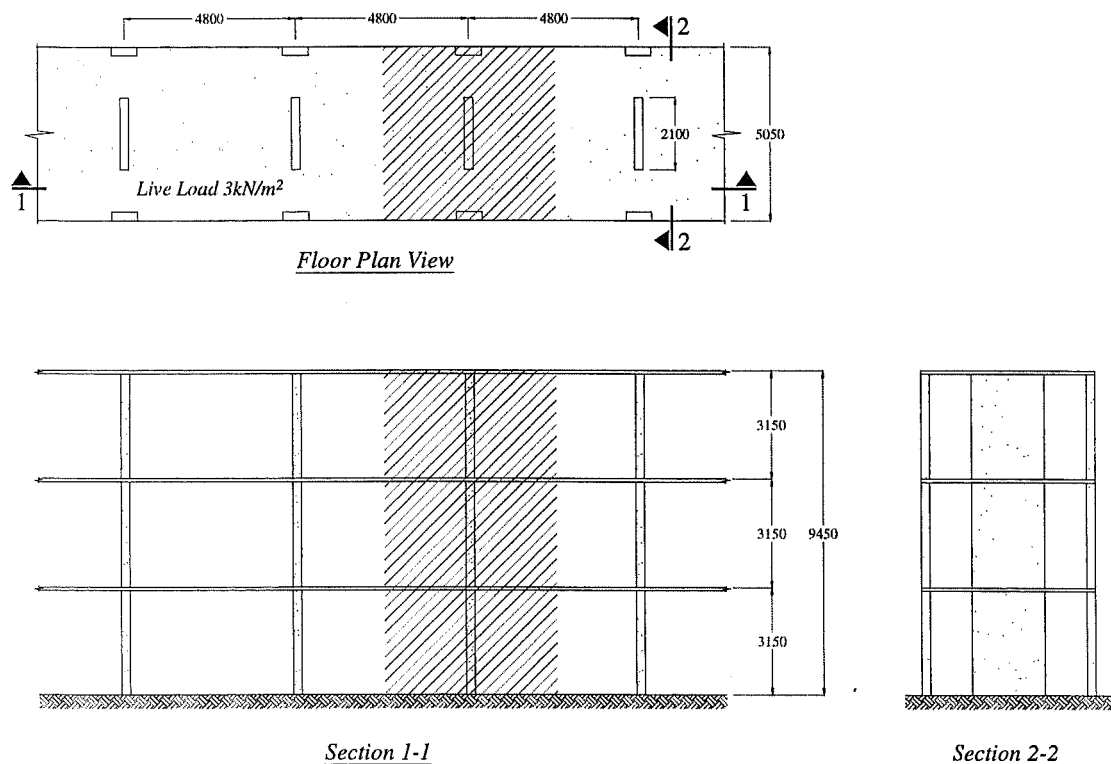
Prototype building showing typical section to be designed (hatched section)
